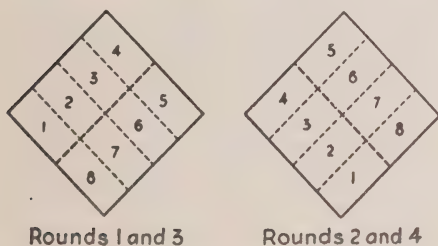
Order of Tamping in Molding of Test Specimens.
